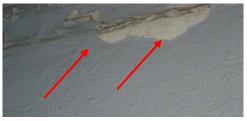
Asbestos-containing exterior wall texture is located on the east wall of the custodial supply area #1 and the custodial common area of the structure.
